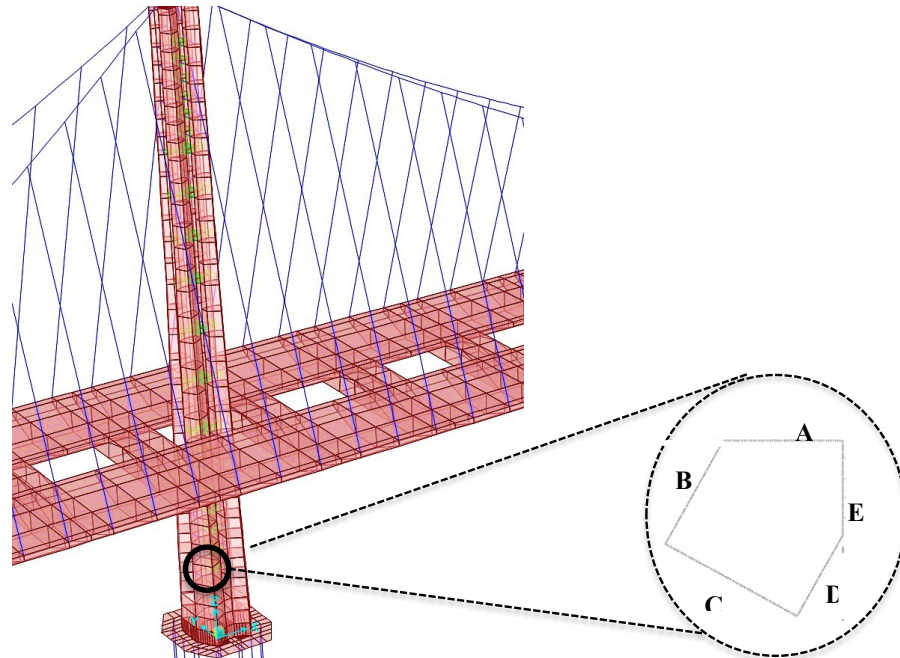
Tower with detail of 1 of 4 tower shafts with plate labeling as in SAP2000 model.
